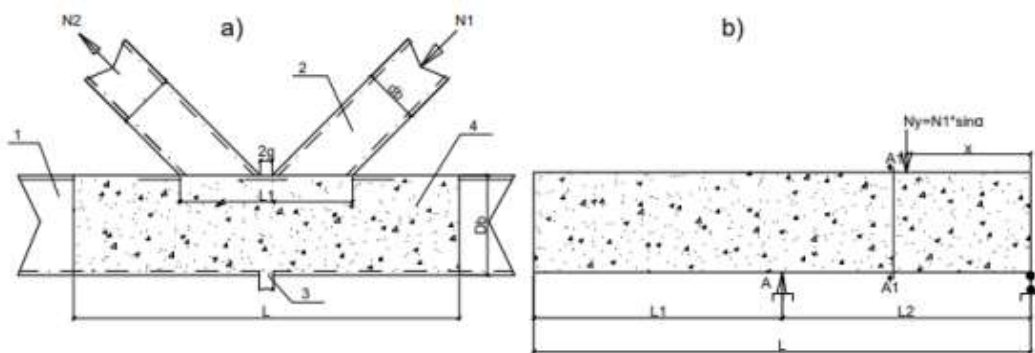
a) node truss from BWP with fiber-reinforced concrete, b) fiber-reinforced concrete block that constitutes the truss of nodes
